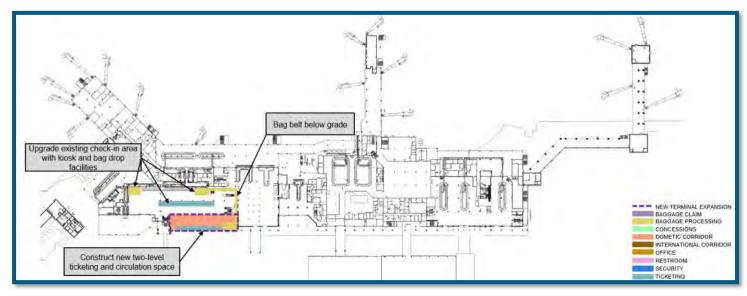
Terminal Services Development Alternative 1: Second Floor
